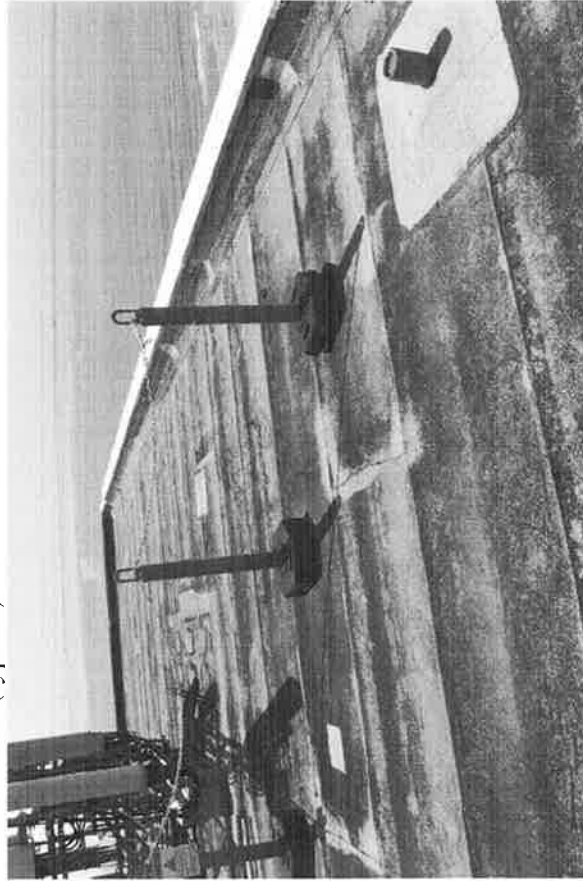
View of aged and deteriorated mod-bit roofing (typical)
